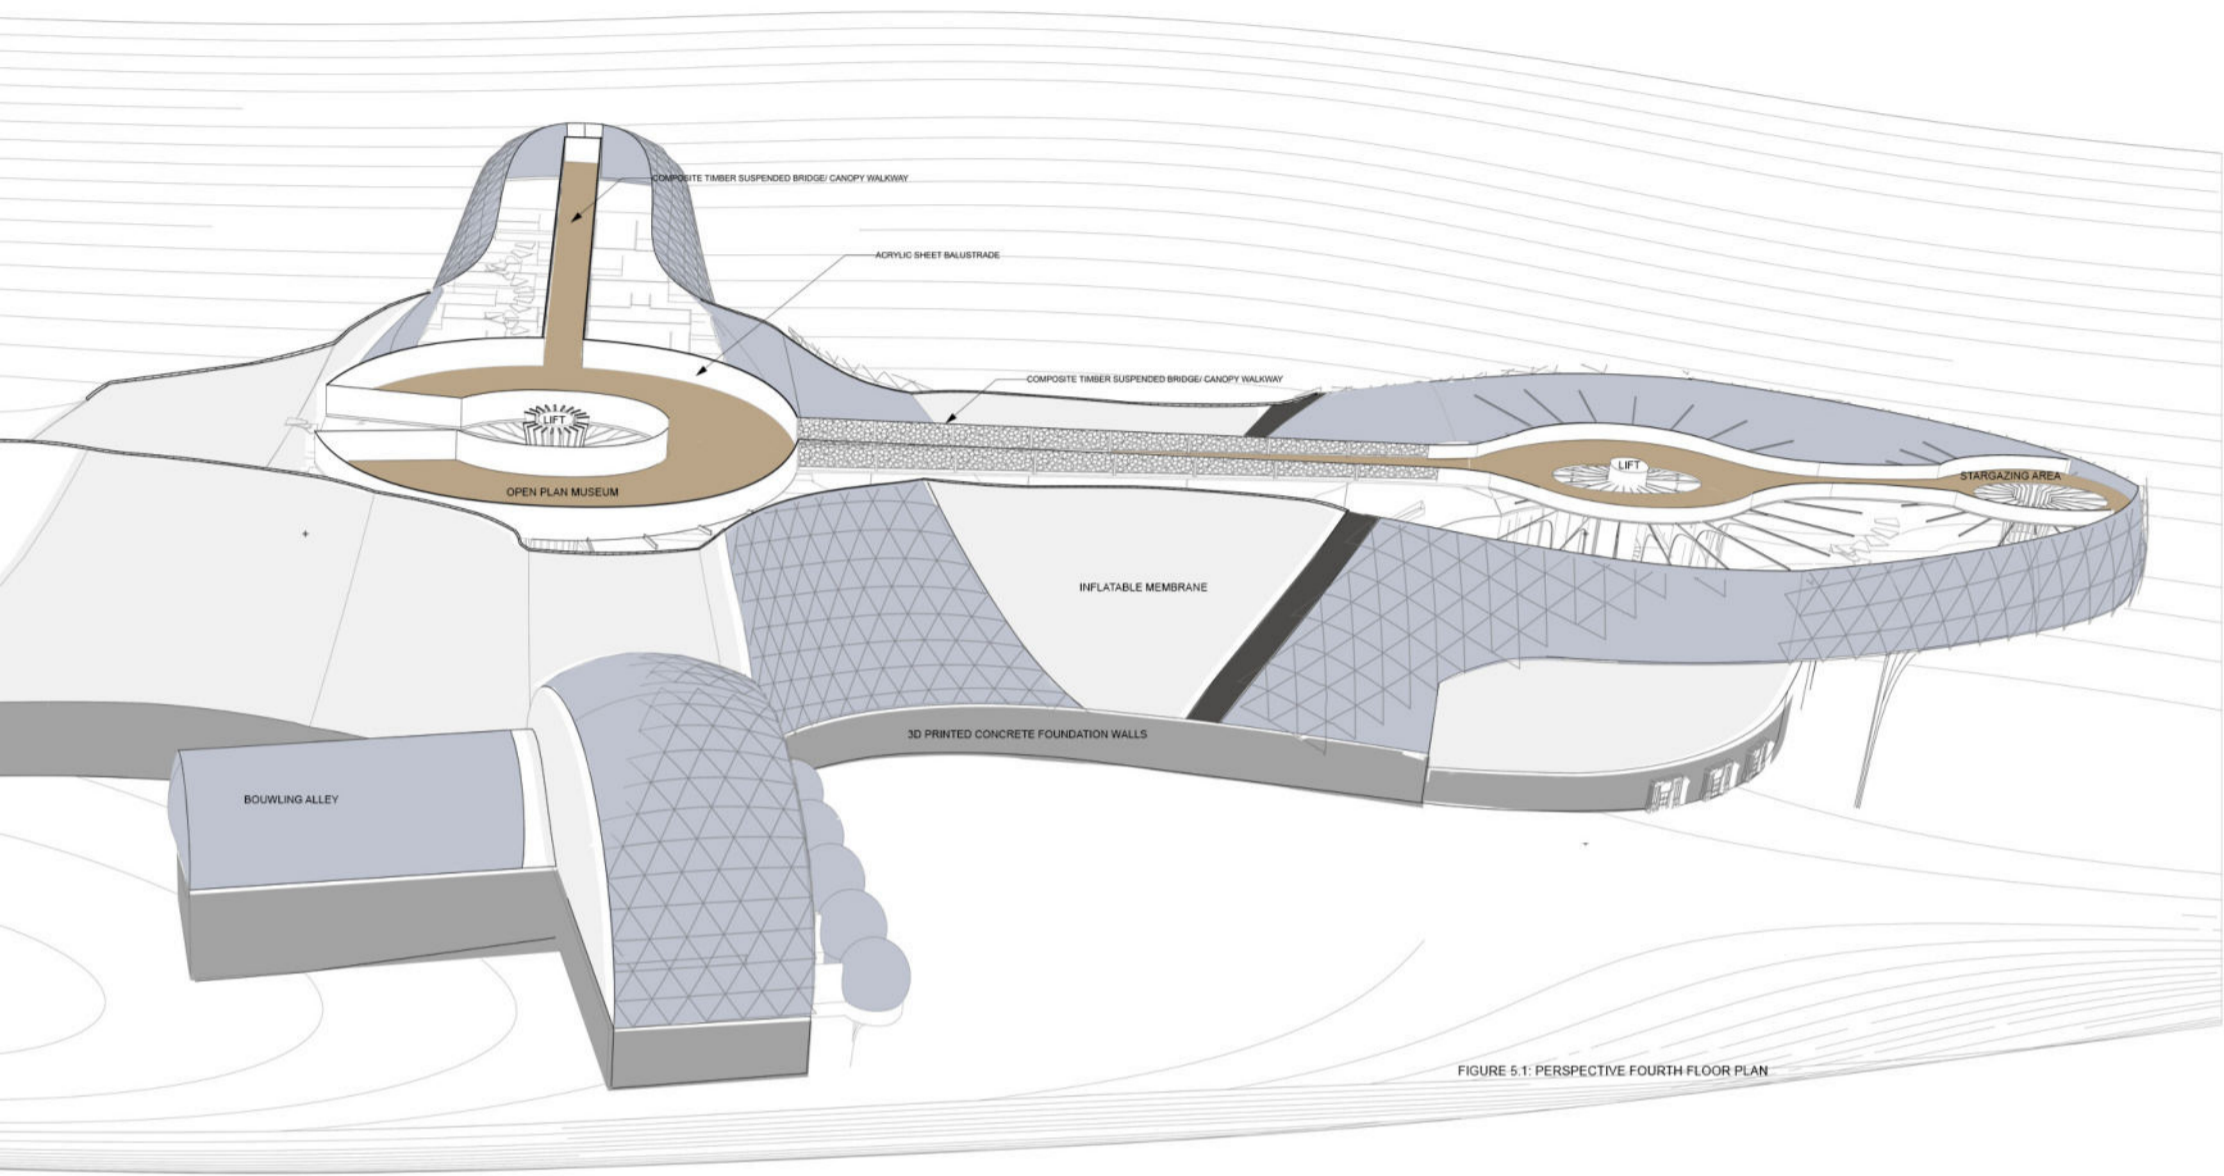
PERSPECTIVE FOURTH FLOOR PLAN
